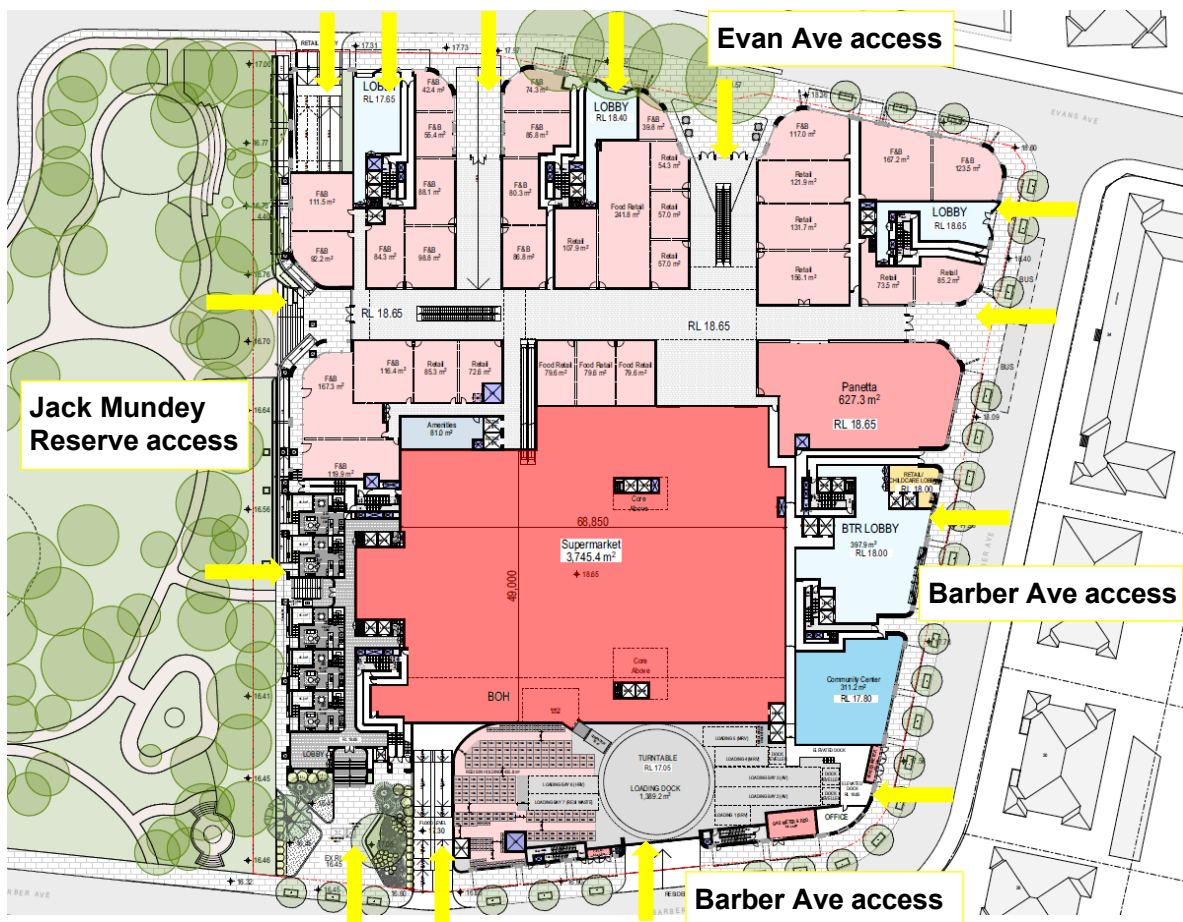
Proposed ground floor plan (Source: DKO / PPUD, 2026)
